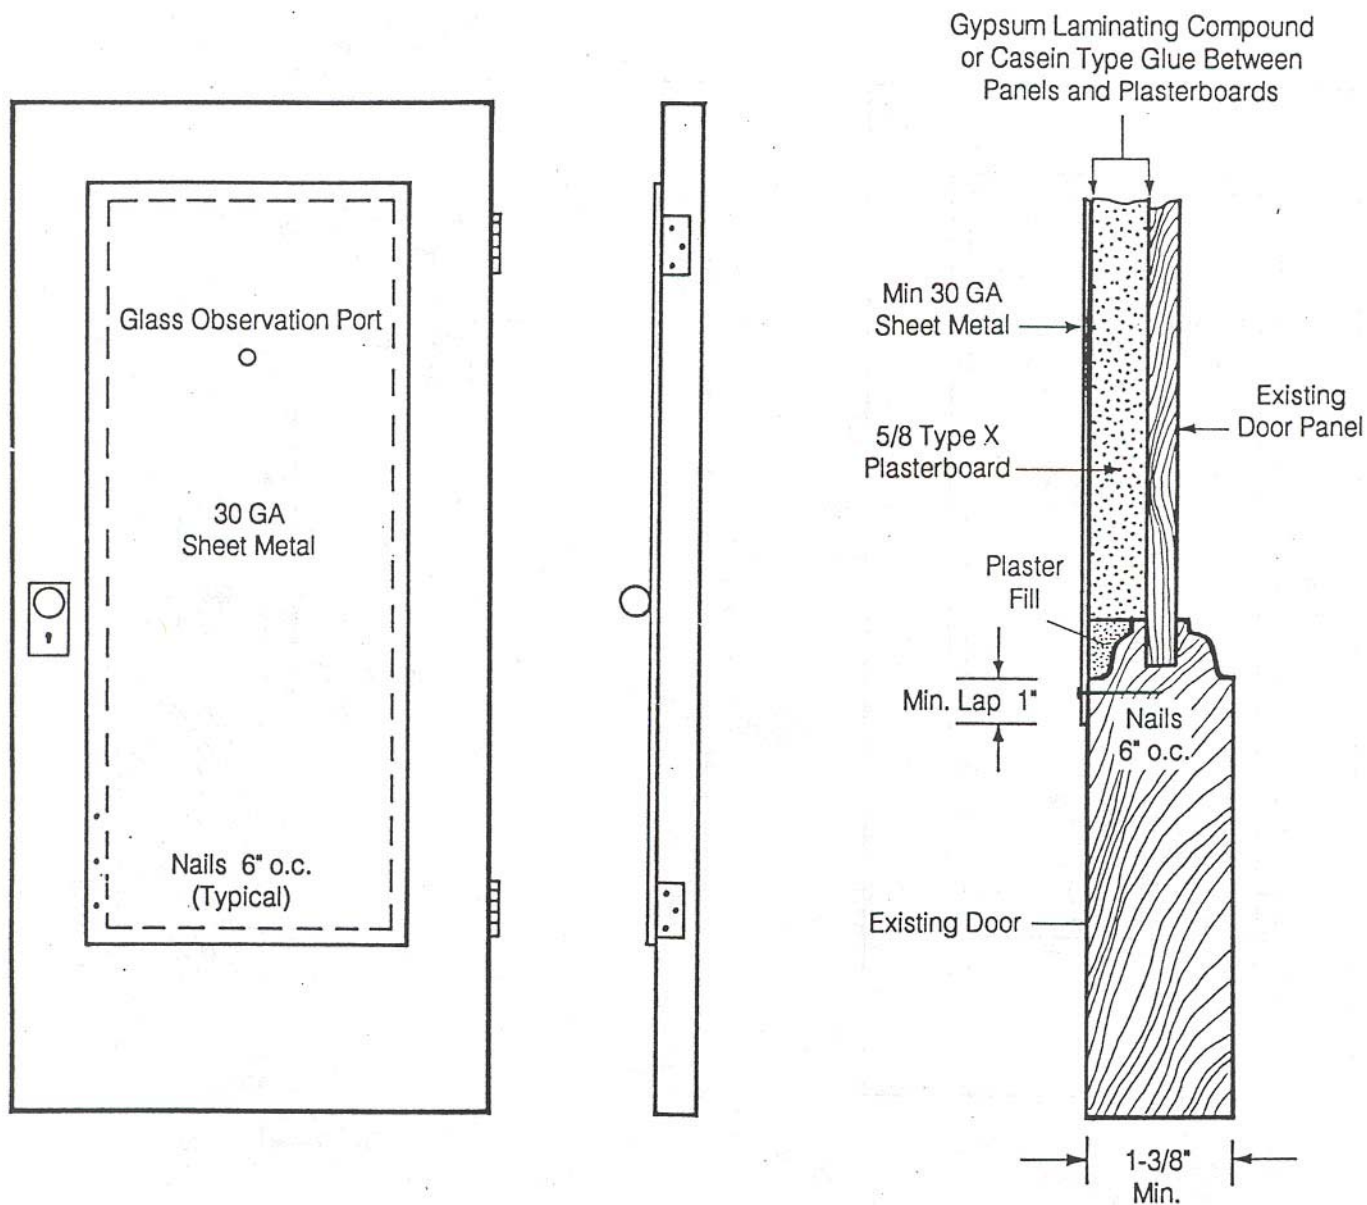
Acceptable Alternatives to 20-Minute Corridor Doors
